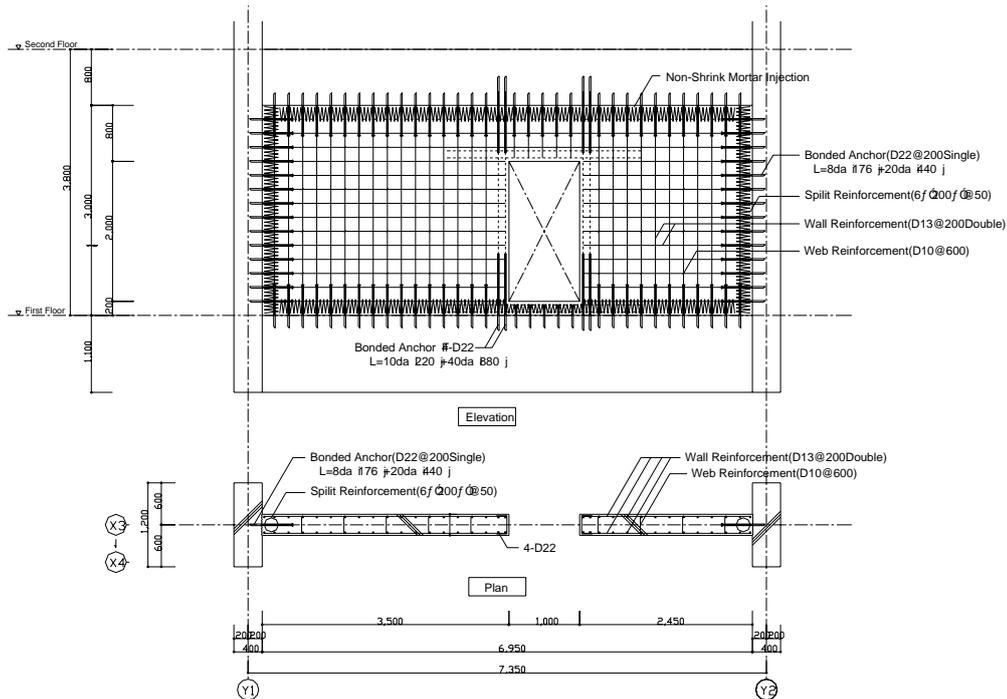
Details of Retrofitting RC Shear Wall with Opening
